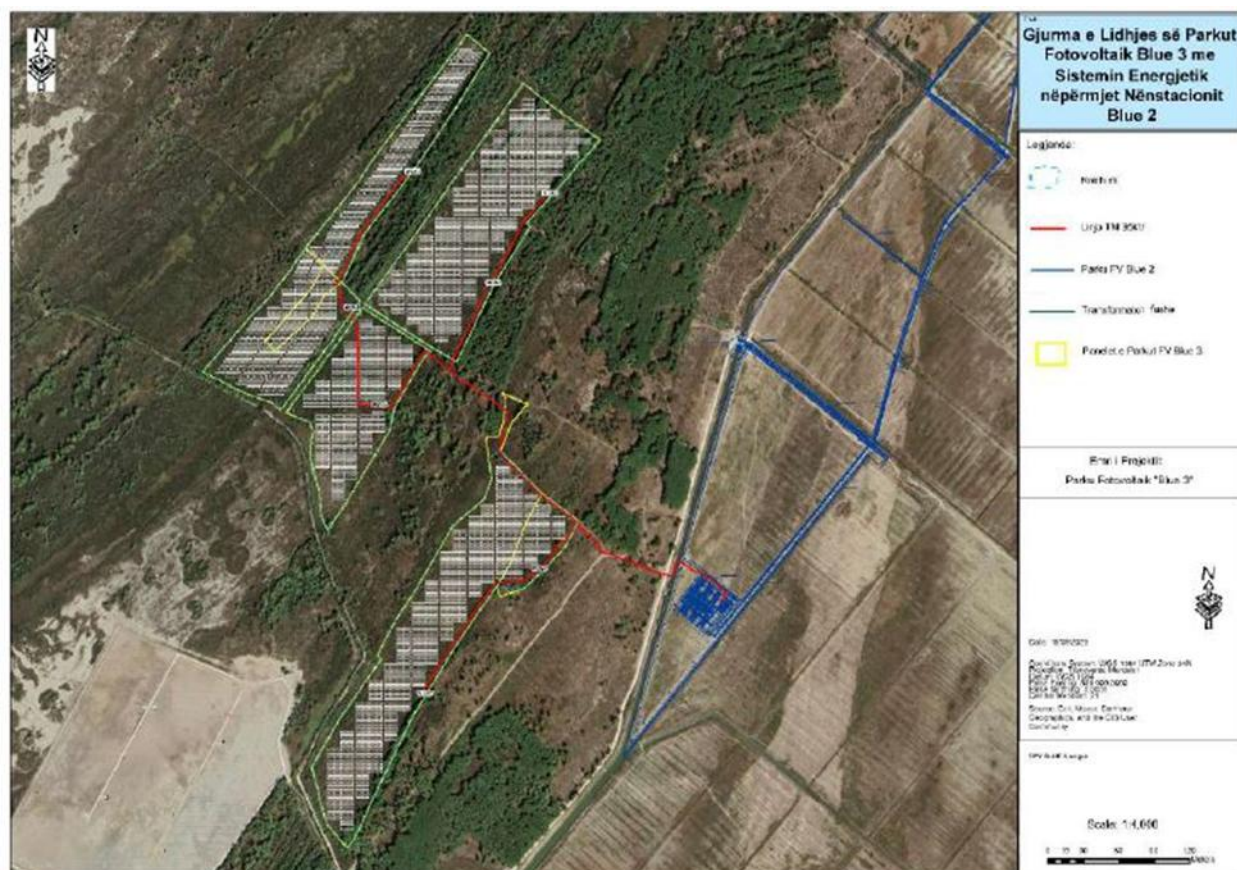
Blue 3 Project Layout and alignment of the grid connection corridor for the FV Blue 3 Solar Park through the Blue 2 Substation
